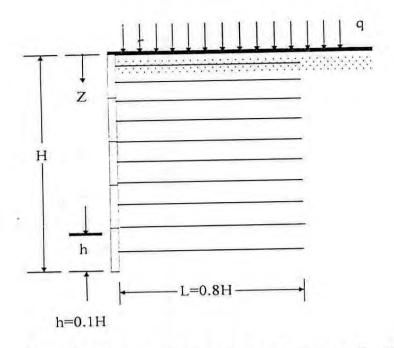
Reinforced Earth Wall (with Concrete Face Panel)
